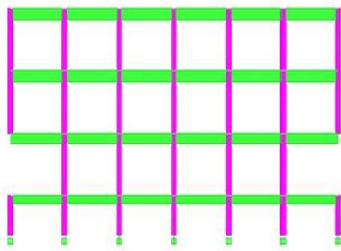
Columns removed in edges of exterior frame in ground floor (elevation view)
